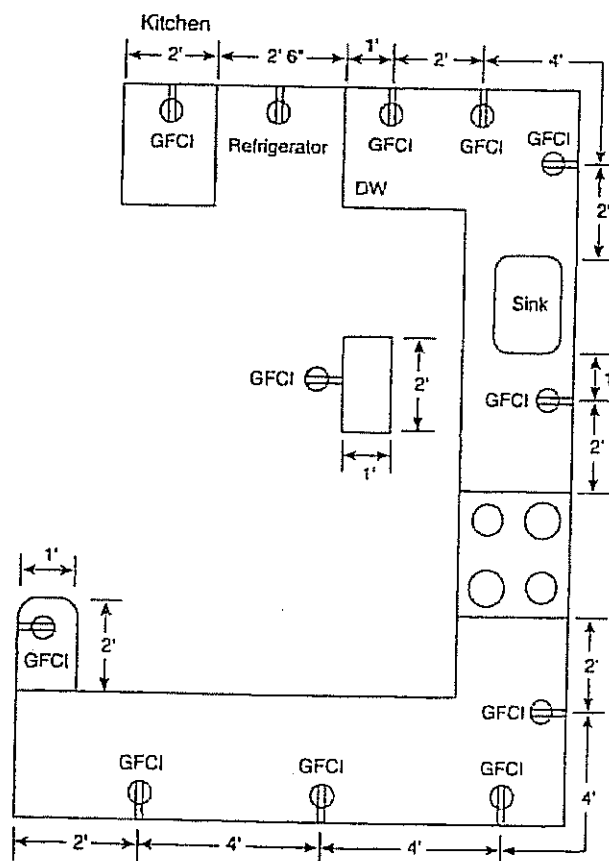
Installation requirements for receptacle outlets installed above or below countertop spaces.
